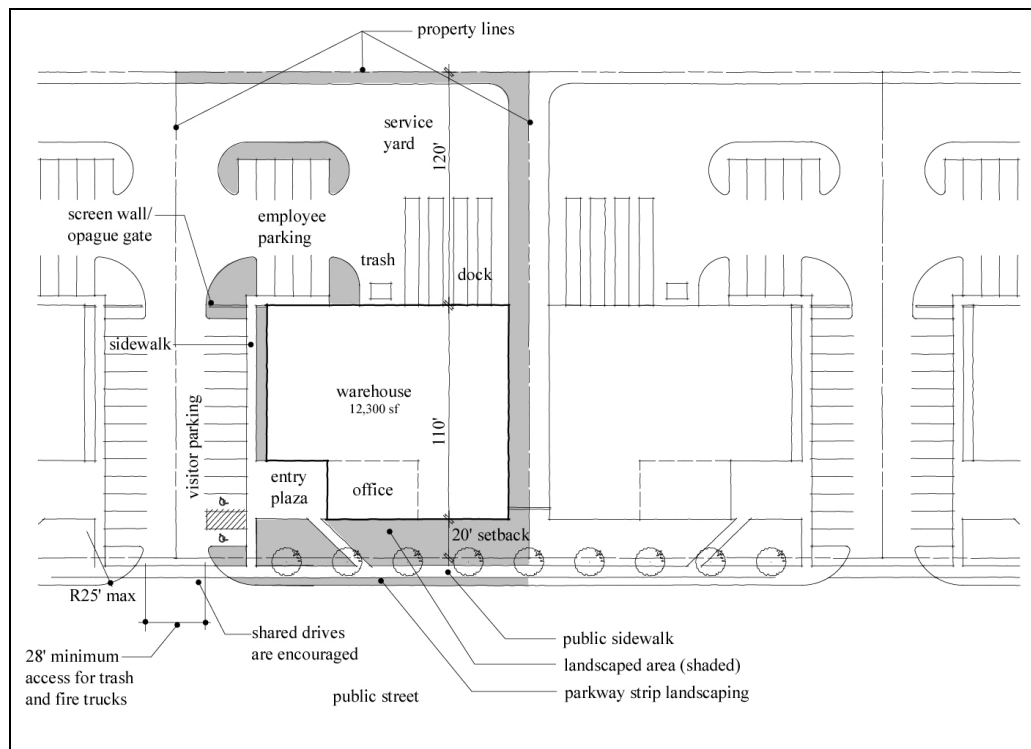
Building Typical Layout Traffic Circulation and Parking with Setbacks
